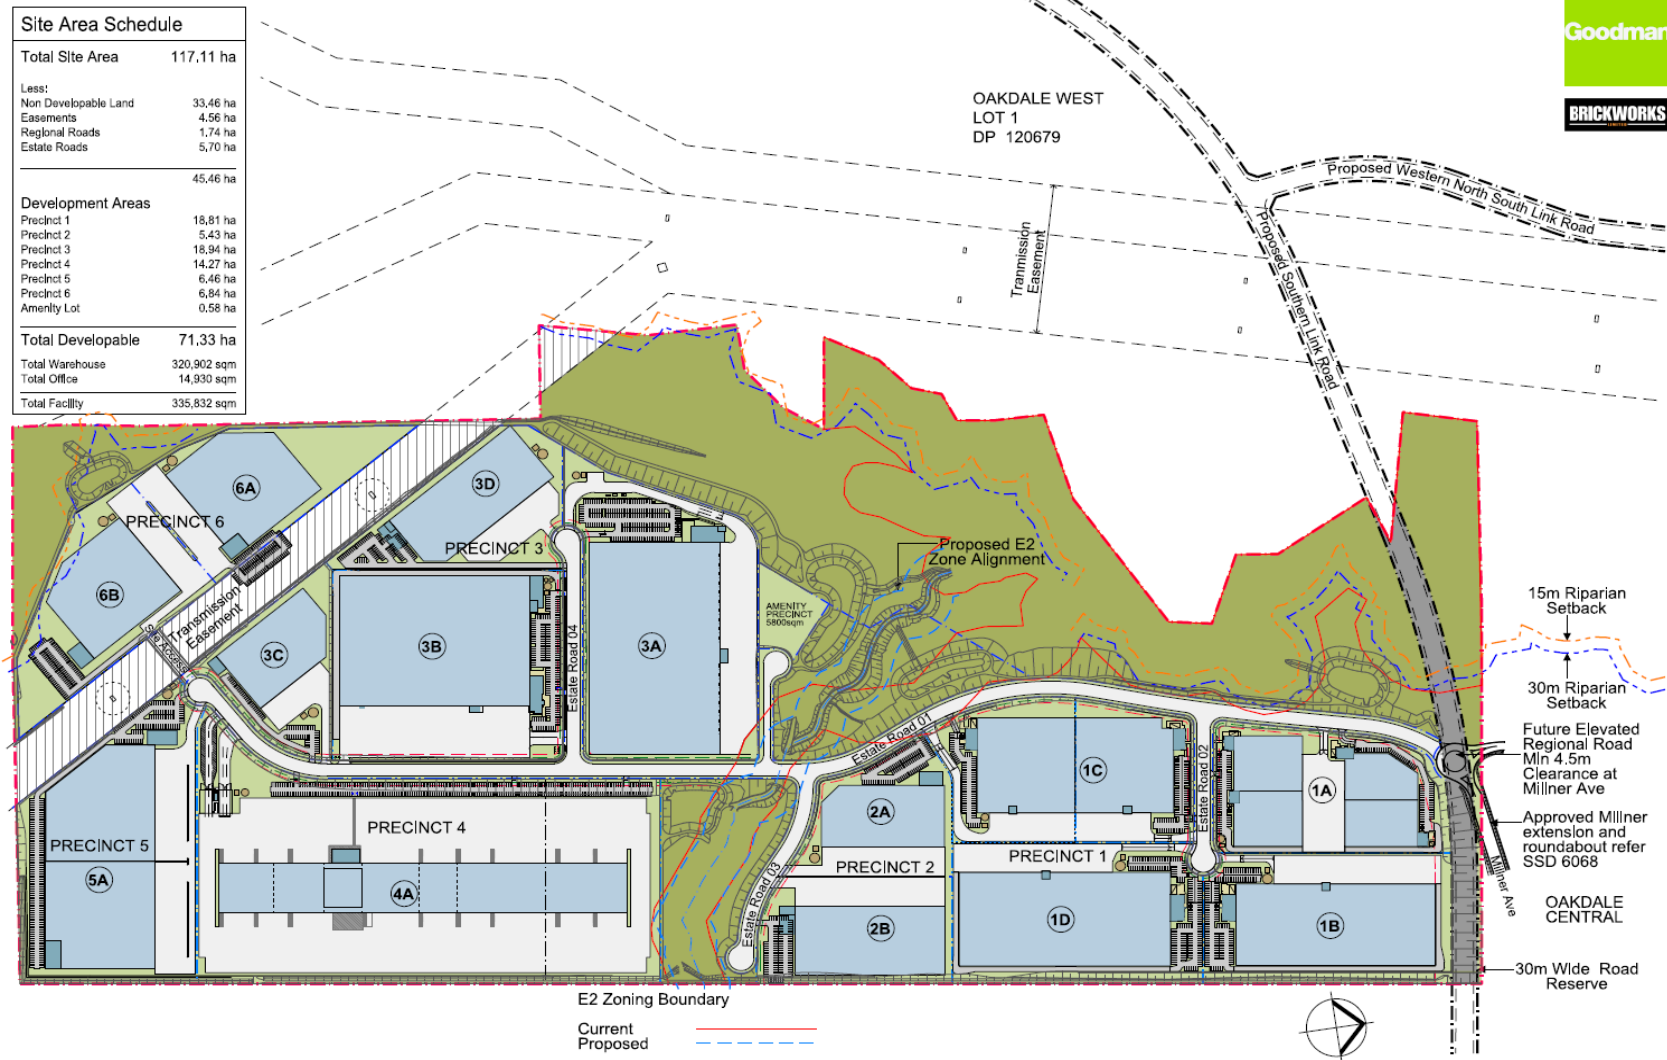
Proposed Staging Plan – Oakdale Industrial Estate – South
